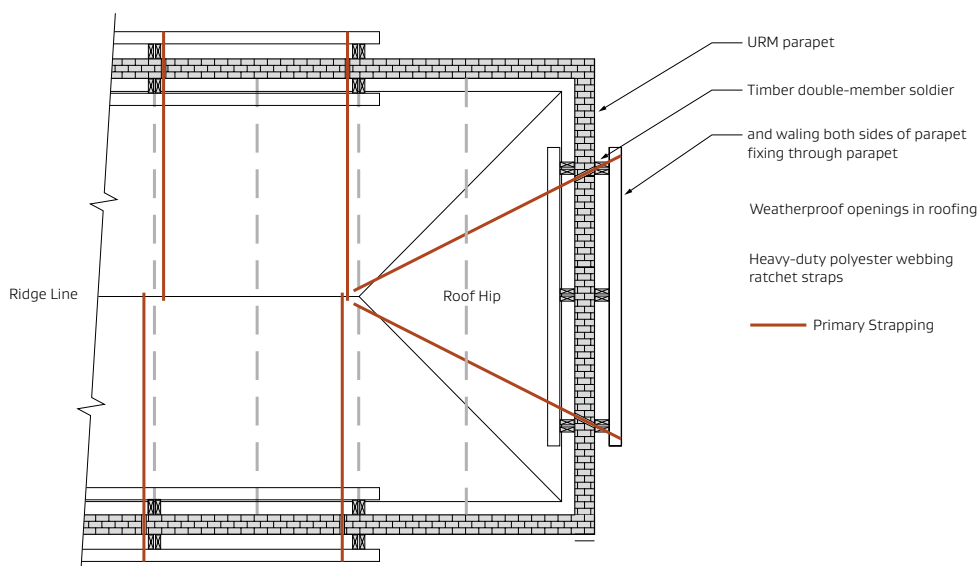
A plan view of the roof and the layout of straps to secure a parapet to a timber frame roof structure
